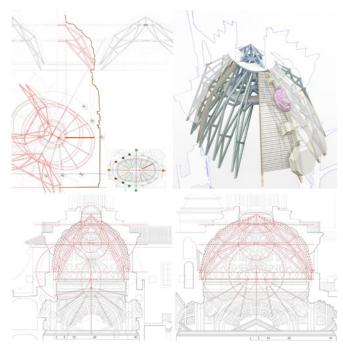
Centering system proposed for the construction of the dome of San Carlo alle Quattro Fontane. Main and secondary ribs. Image and drawings by the author.
